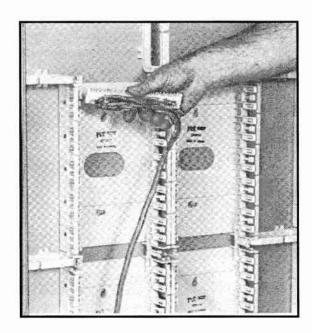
A 25-Pair Cable terminated on a BIX 1A Rail.
